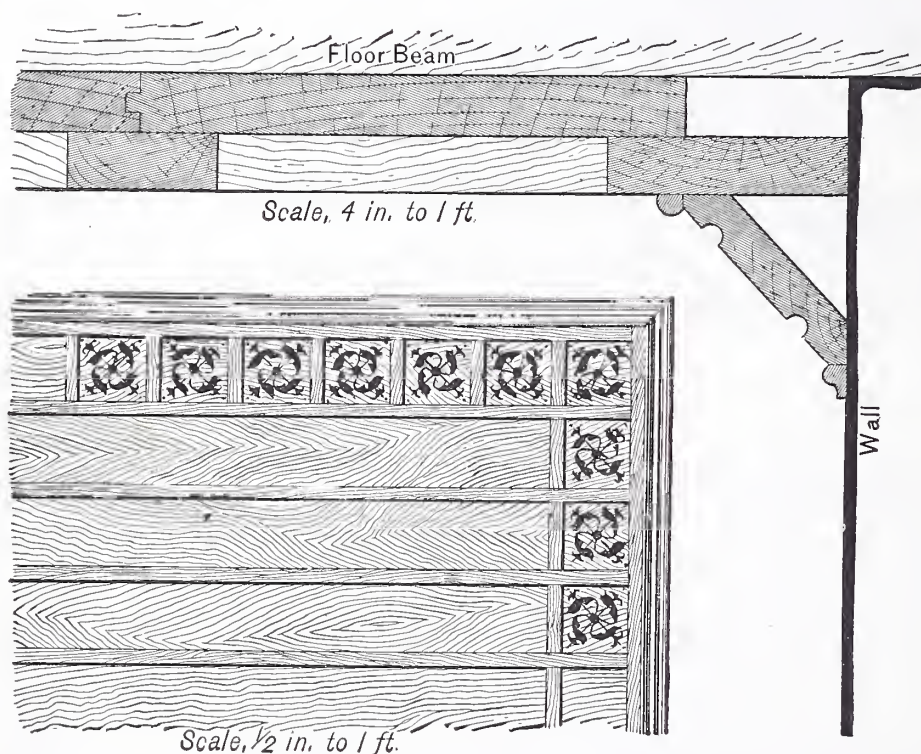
SECTION AND PLAN OF DINING ROOM CEILING.
